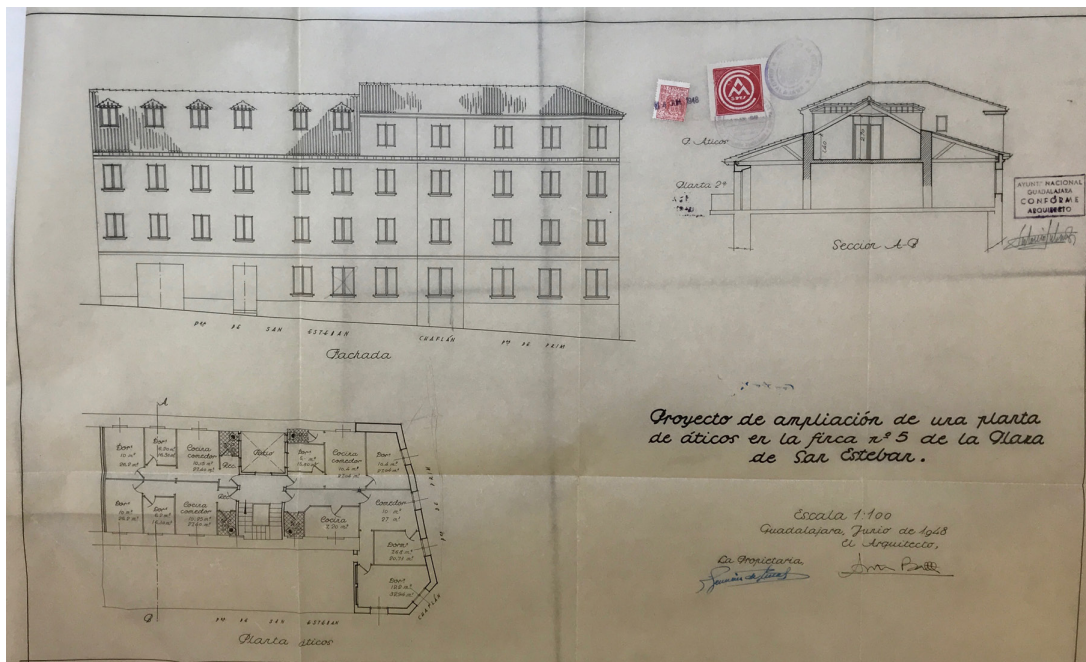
Plan for the extension of a penthouse floor at the property at Plaza de San Esteban, no. 5. GMA
